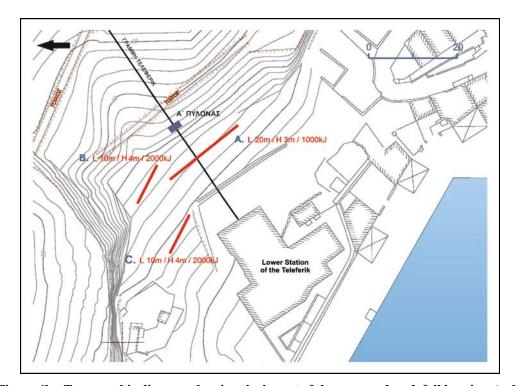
Topographic diagram showing the layout of the proposed rock fall barriers (a, b, c) above the installations of the Lower Station of the Teleferik.
